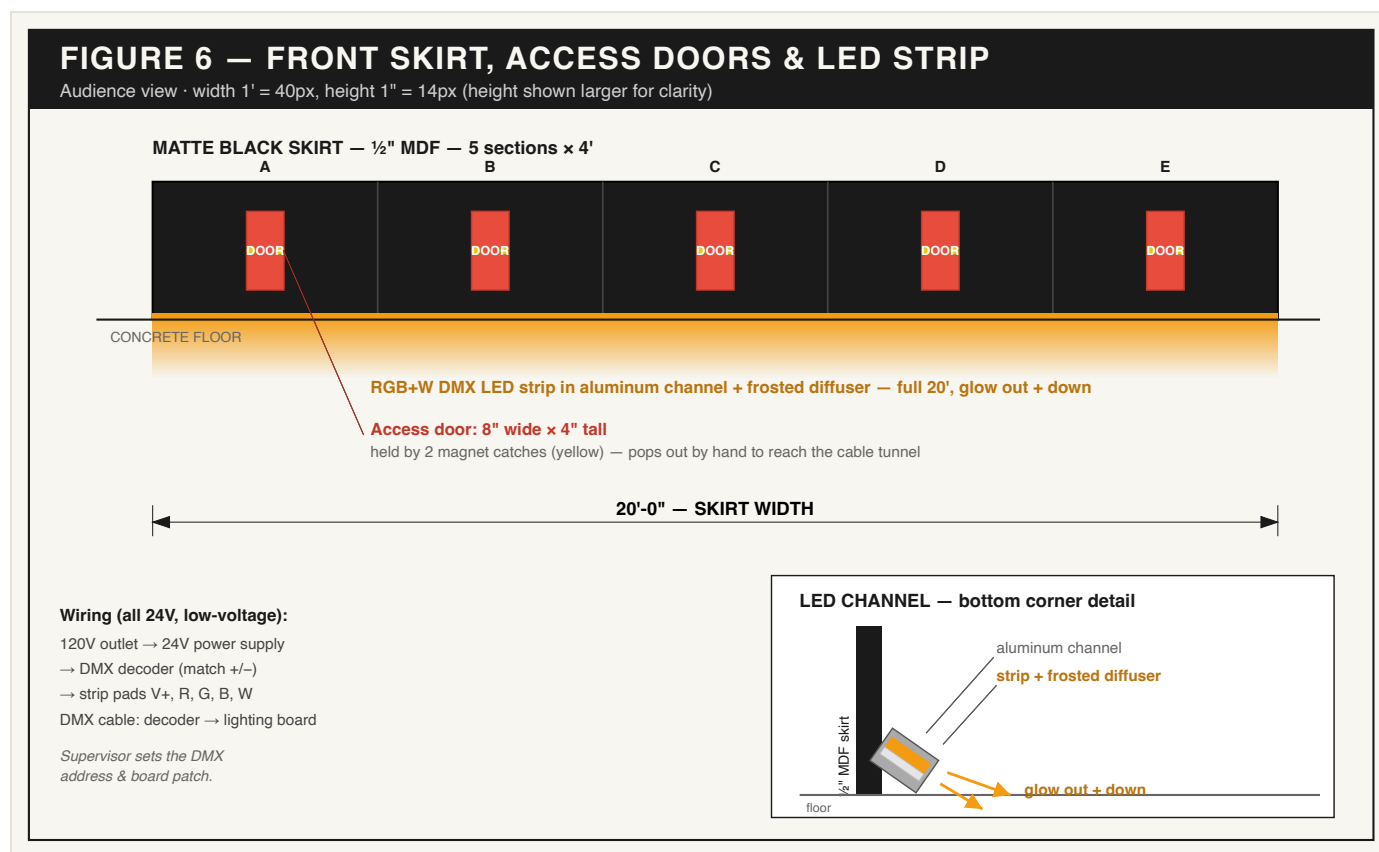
Front skirt: 5 sections of ½" black MDF, each with a magnet-held access door over a cable tunnel, LED channel along the bottom.
